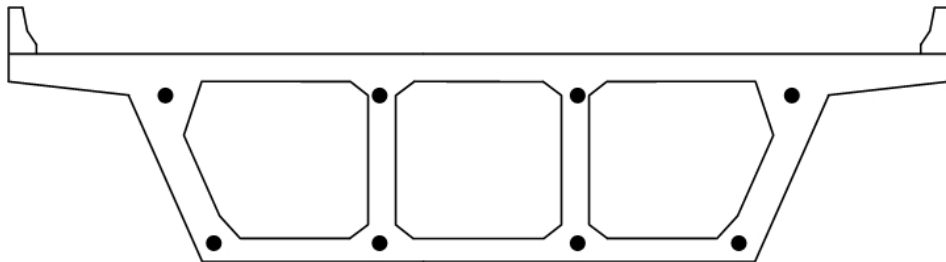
Multi-cell Girder: Post Tensioned
